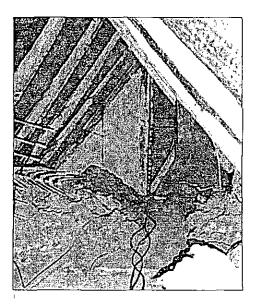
Southern end of roof space. Timber rafters and the lath and plaster partition are visible
